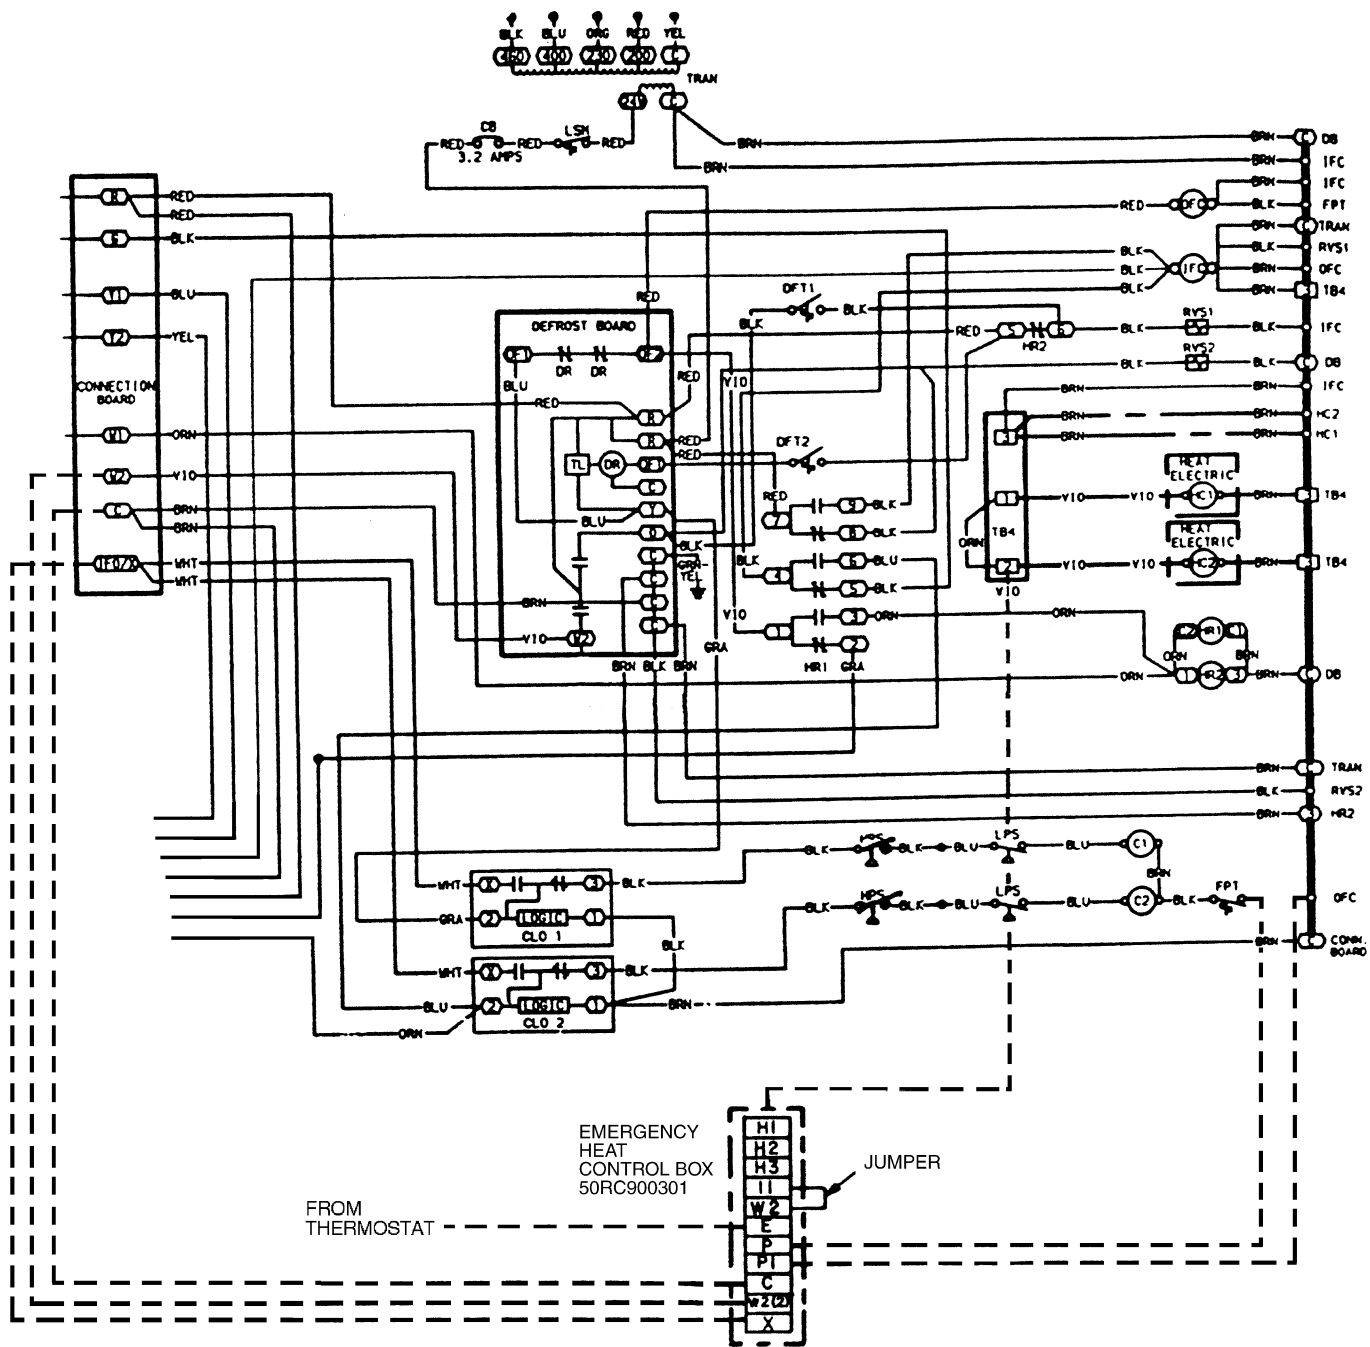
Emergency Heat Control Wiring With Single-Stage Electric Heater and Two Compressors, 50TFQ008-012
